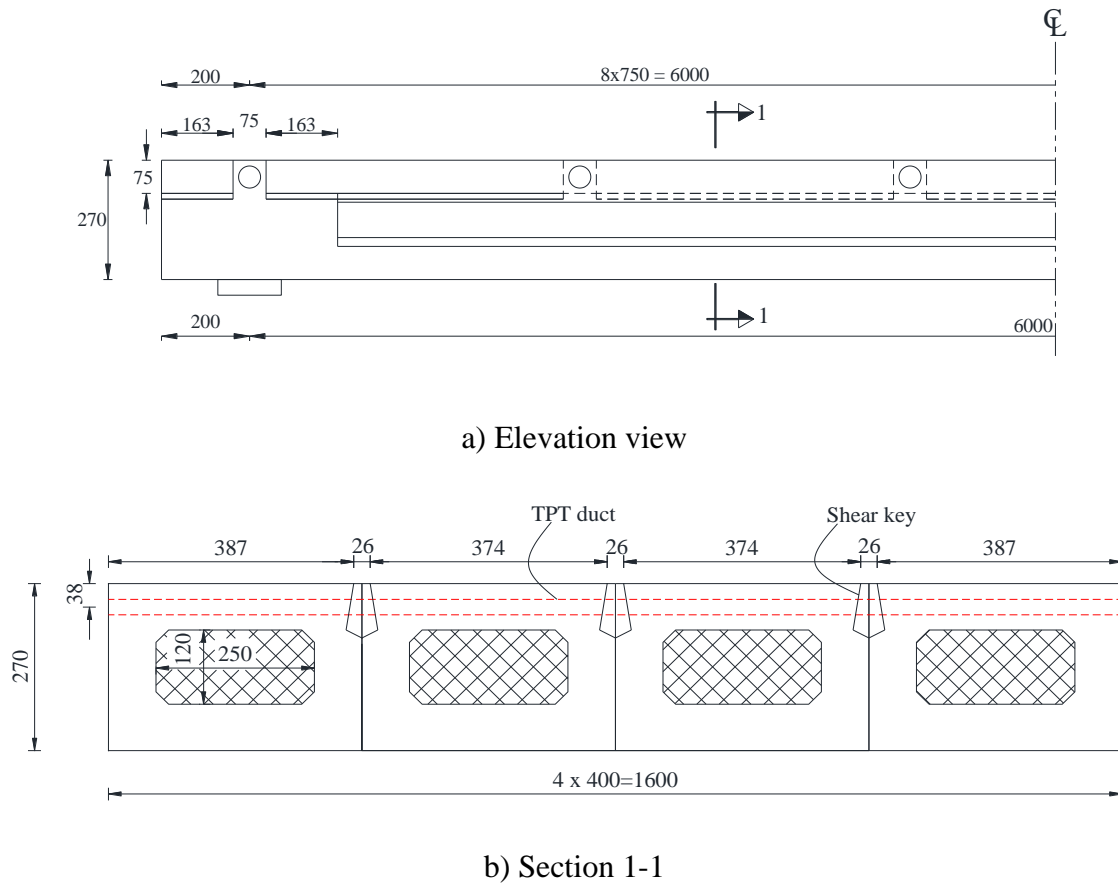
Geometry of bridge model (dimensions in mm).
